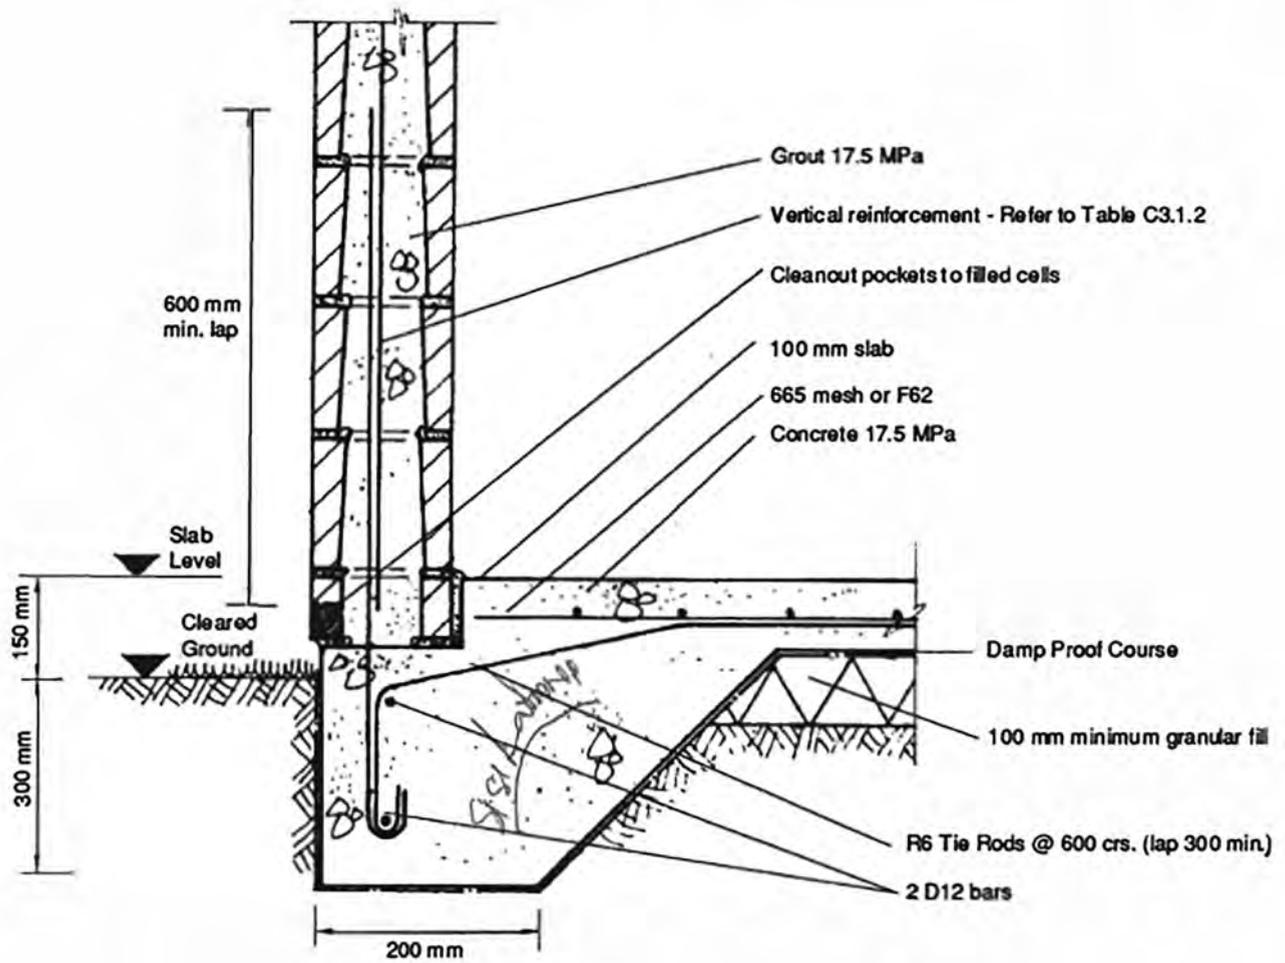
DETAIL OF STEP-DOWN FOOTING
